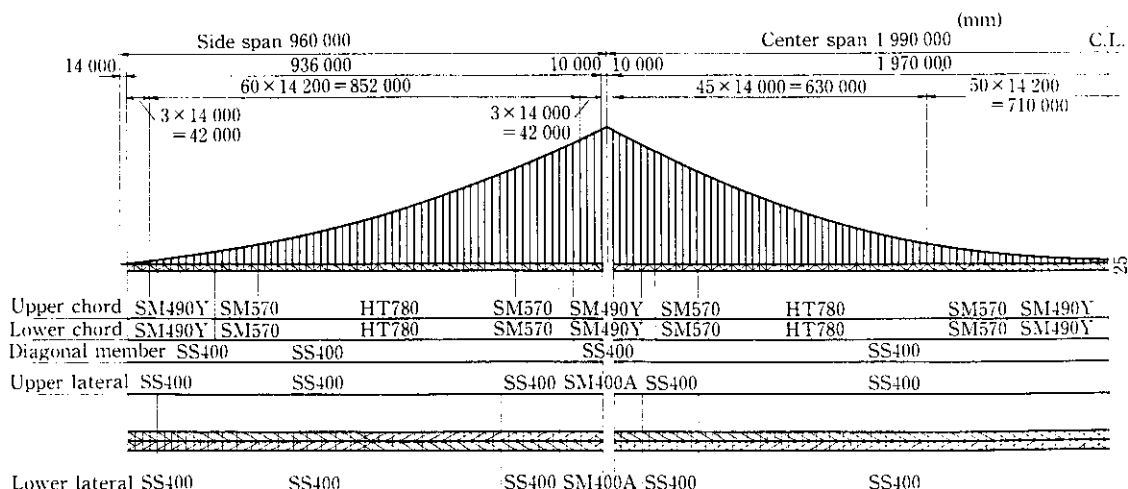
General view of the ultra-long span suspension bridge and stiffening truss materials used
